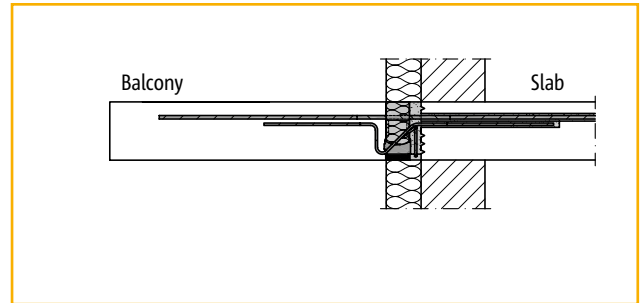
Balcony freely cantilevered with direct support with extension of an existing balcony - cross-section
